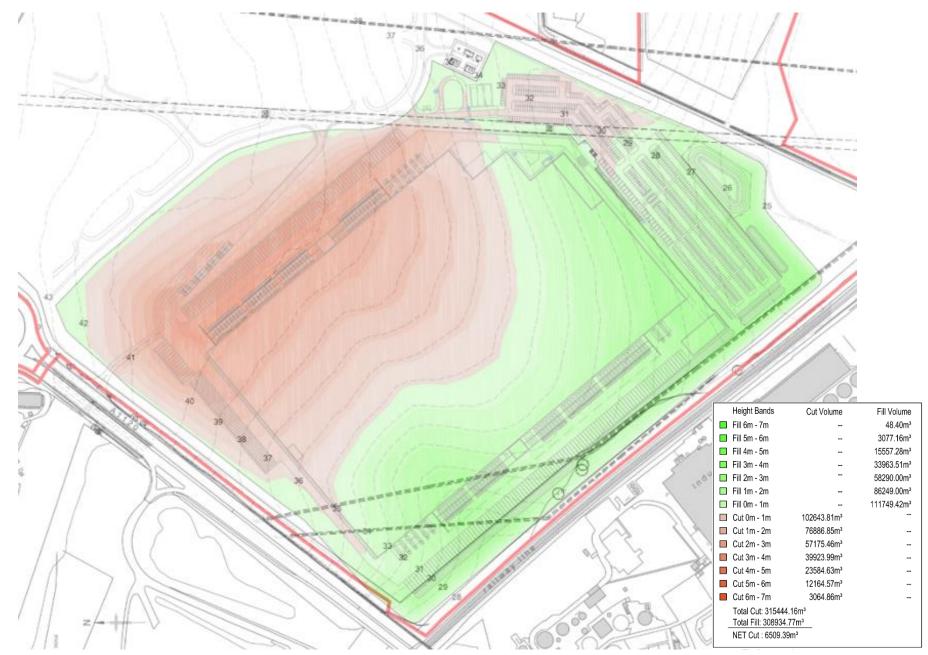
Existing site plan with levels submitted at outline overlayed on proposed cut and fill plan accompanying reserved matters
